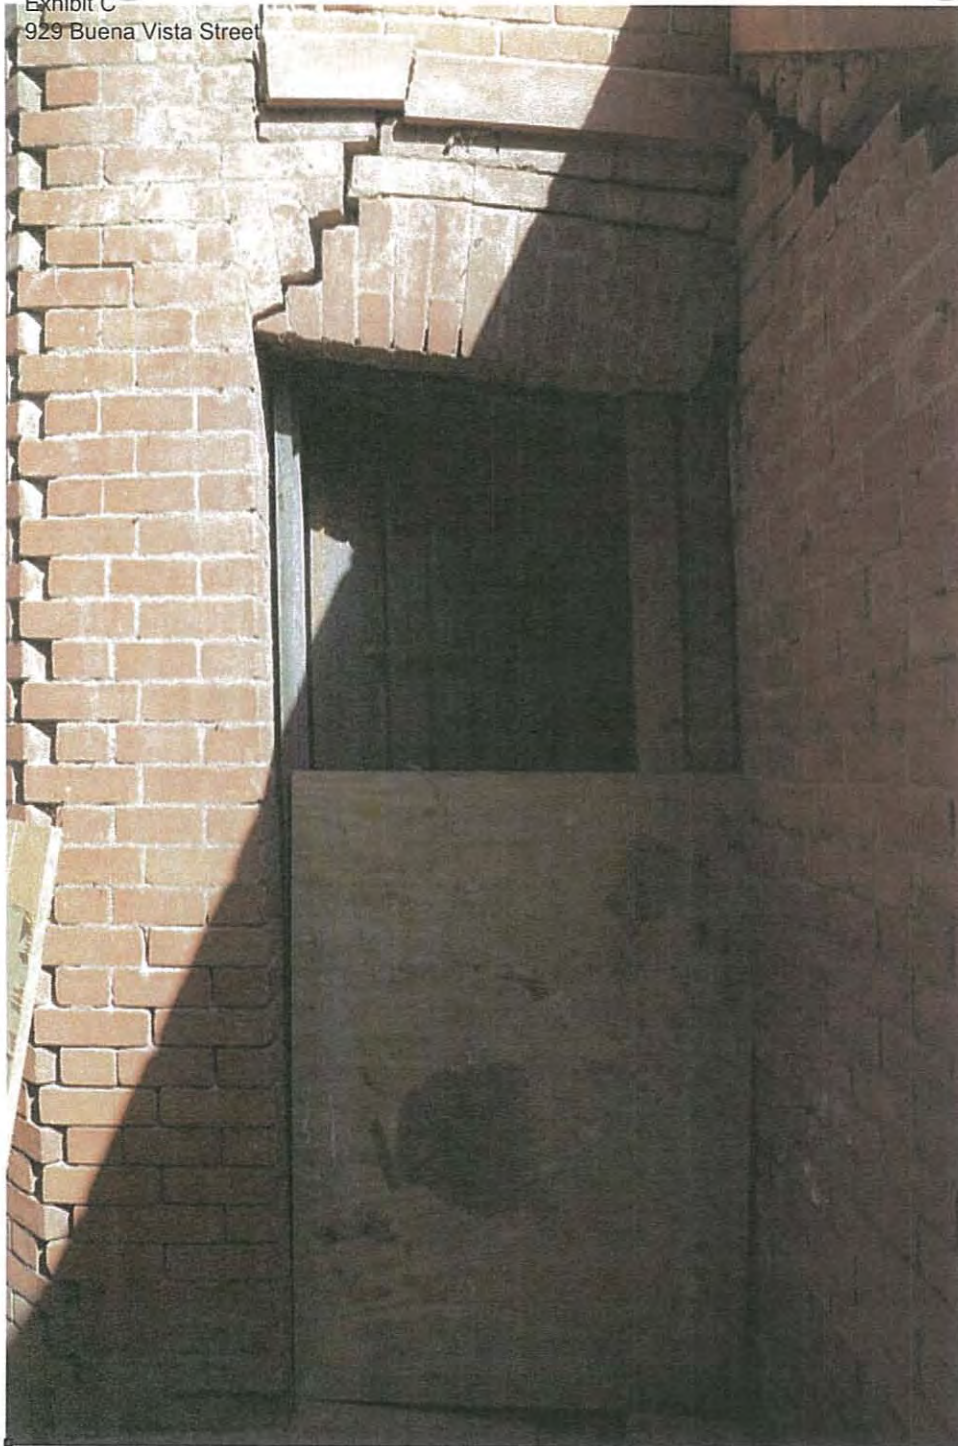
West stairs, splitting/cracking and material failure at lintel leading to basement door and brick railings and stairs.
